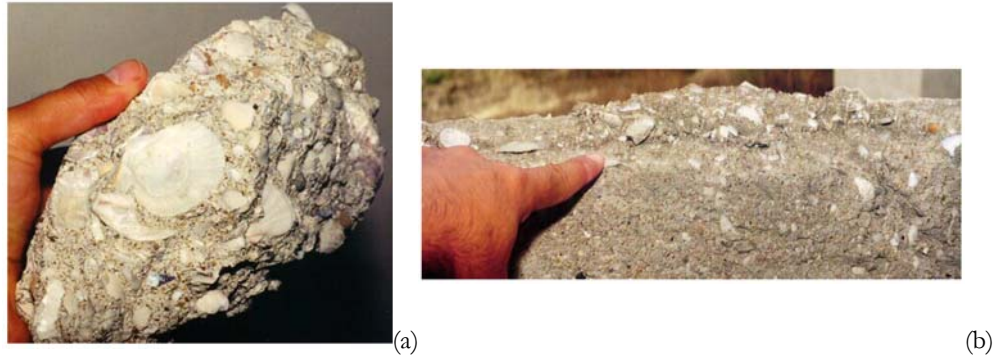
Izmit earthquake: seashells found in (a) a piece of concrete; (b) a beam [Çağatay, 2005]
